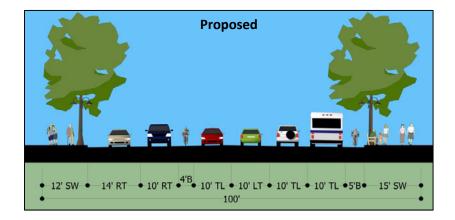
North San Fernando Boulevard: Typical Section from Walnut Avenue to Burbank Boulevard (Looking Northwest)
